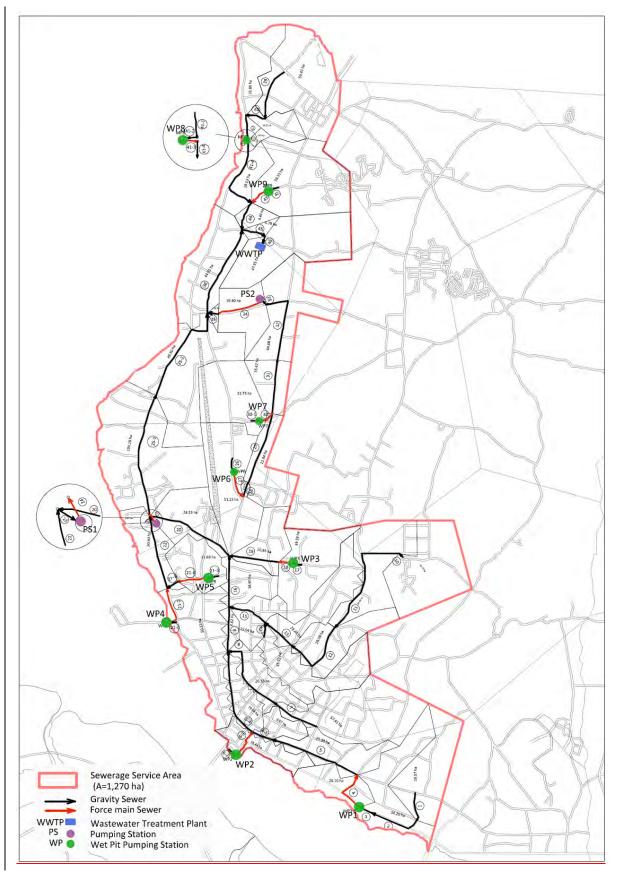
General Layout Plan of Tagbilaran Sewerage System
